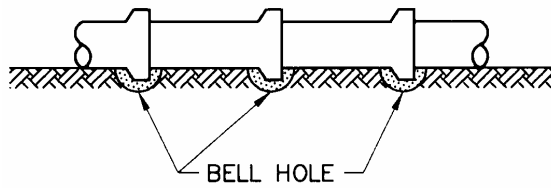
Excavation of Bell Holes for Uniform Support.
